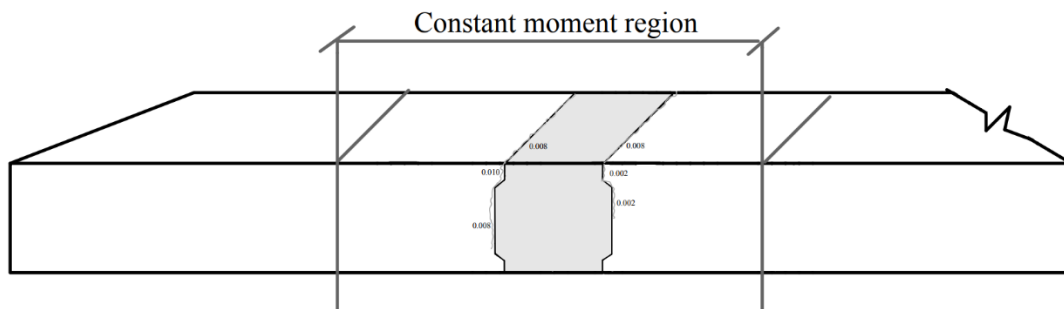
Crack Propagation for Proprietary Long-Term Specimen at 30 % of Final Load
